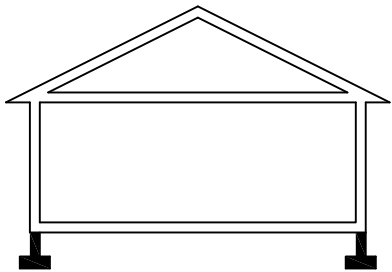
ROOF, CEILING AND ONE CLEAR-SPAN FLOOR
